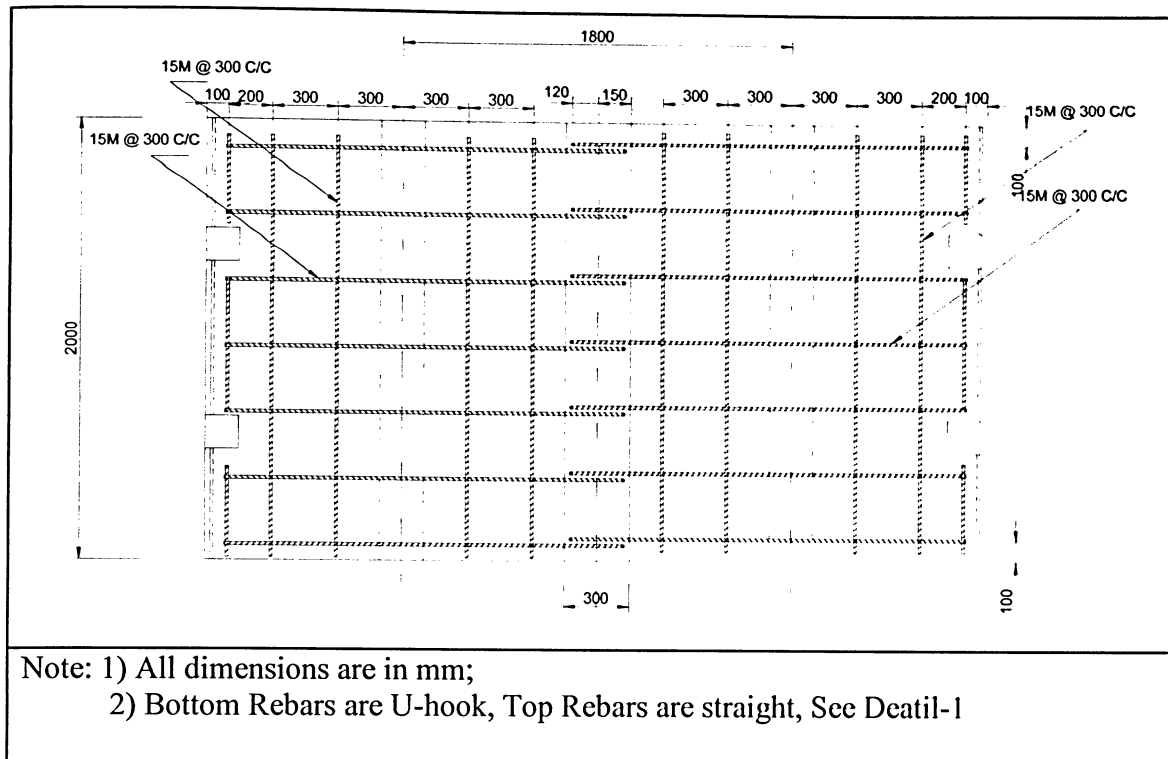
(a) Plan of Top and Bottom Rebar Arrangement for Models M2
